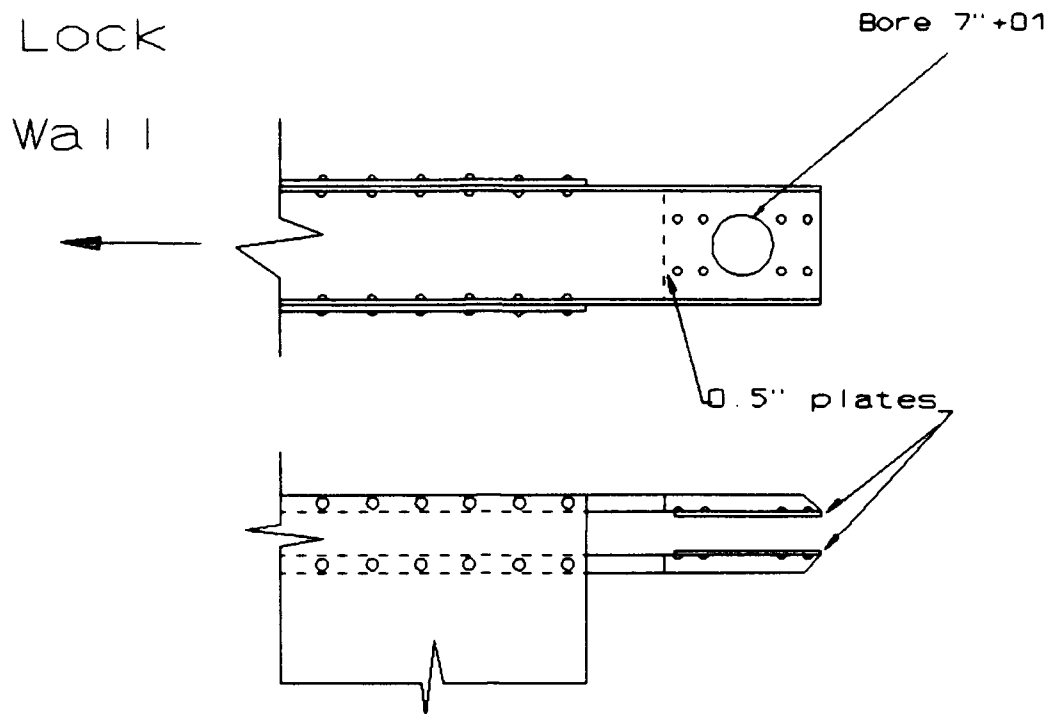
Lock and Dam 26 miter gate embedded top anchorage
